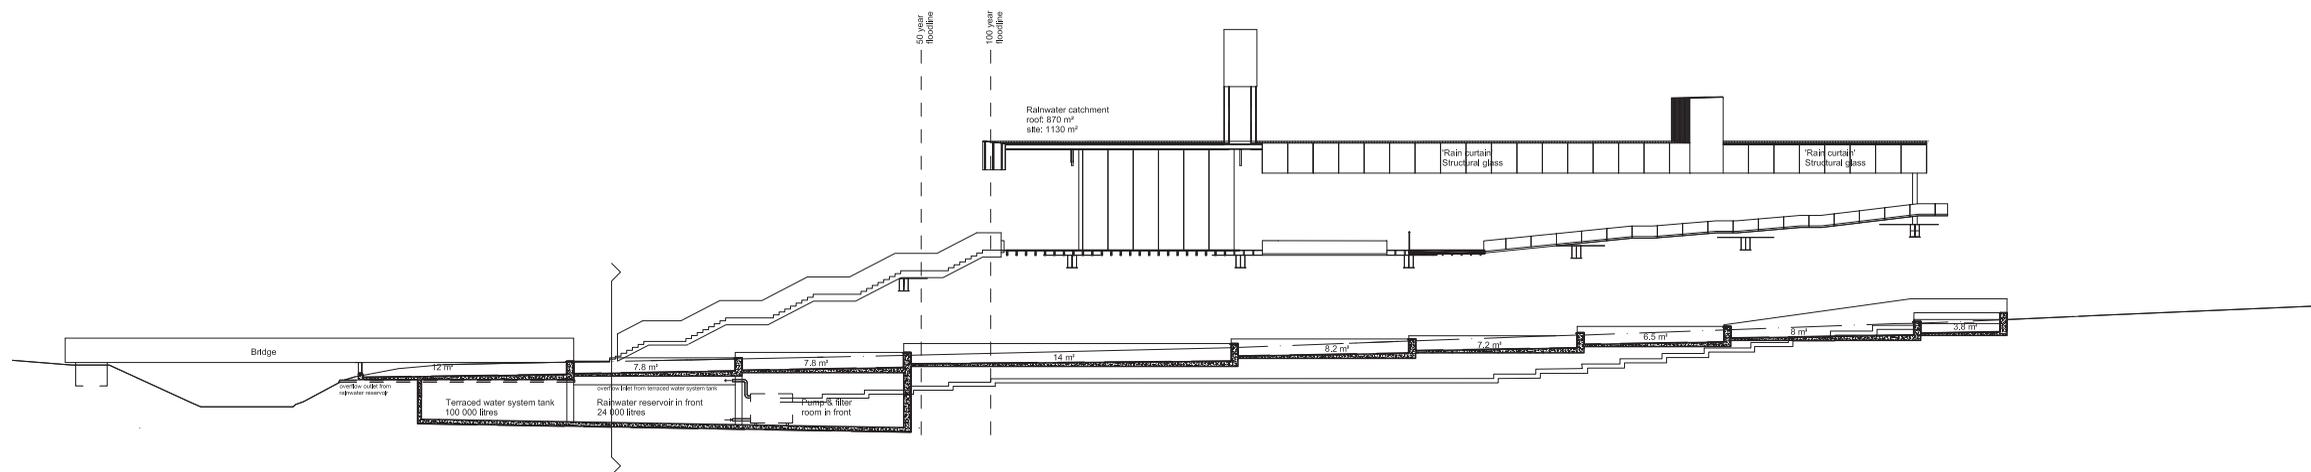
Section B-B. The roof-wall-pond effects mechanism brings rainwater, sunlight and wind into play.
